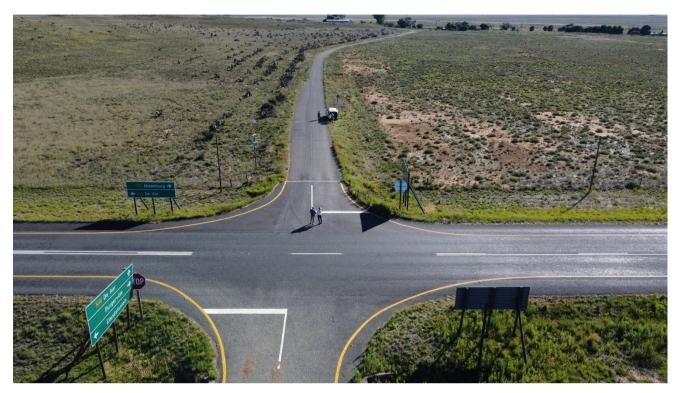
Start of the access road – N10/Burgerville public district road intersection (facing Northeast).
